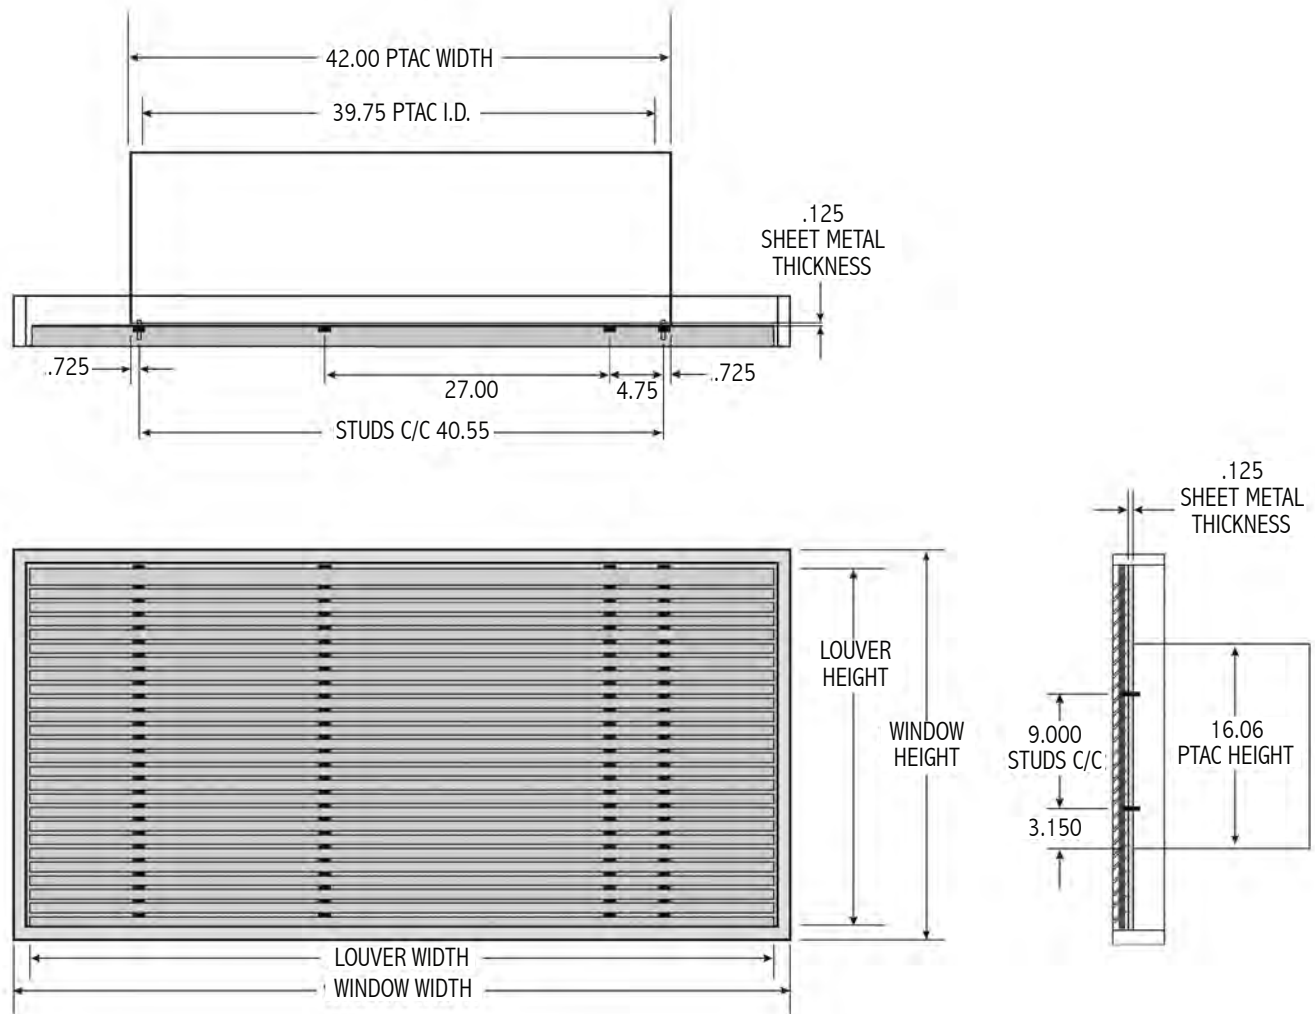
Wall Sleeve Dimensions and Mounting Hole Locations for Installation of Exterior Louver Grille by Others
